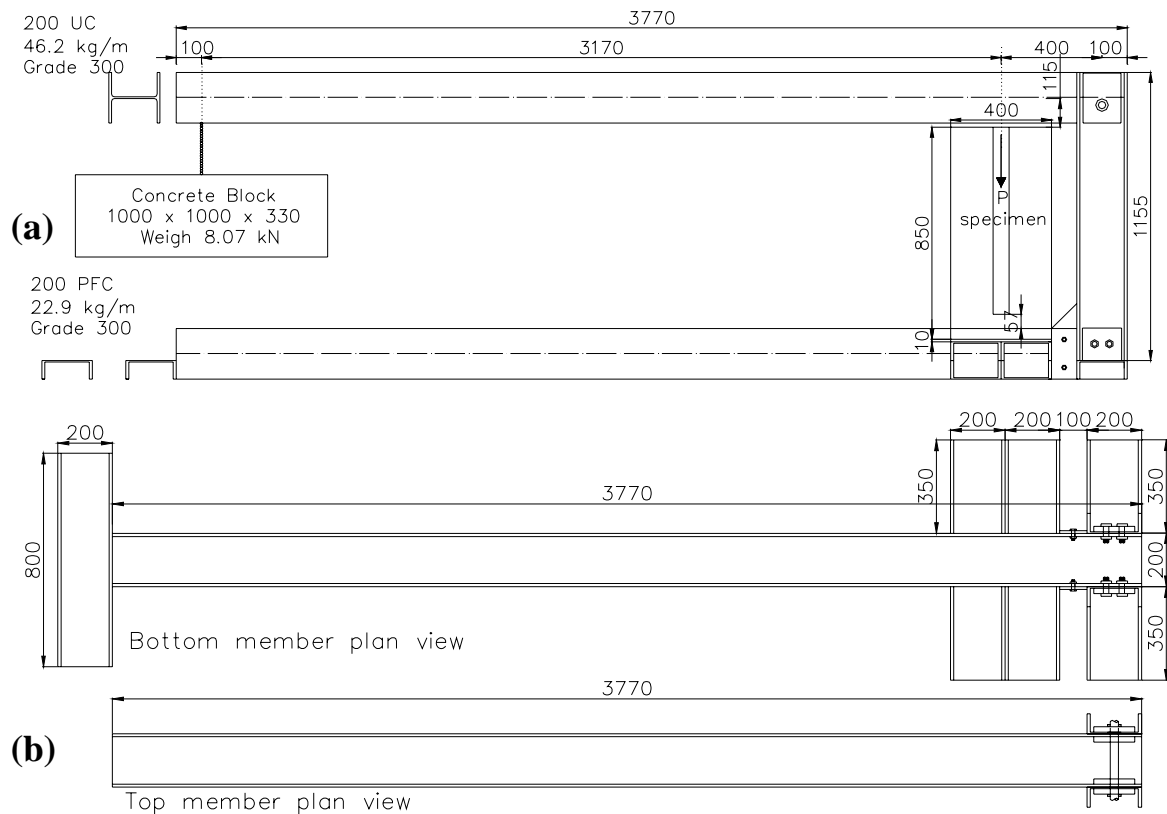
Frame 2 for rectangular notched connection push-out specimen: (a) Side elevation; and (b) Bottom and top member plan view
